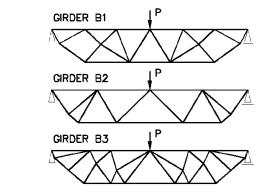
Method of loading girders B1, B2 and B3 with unit force
